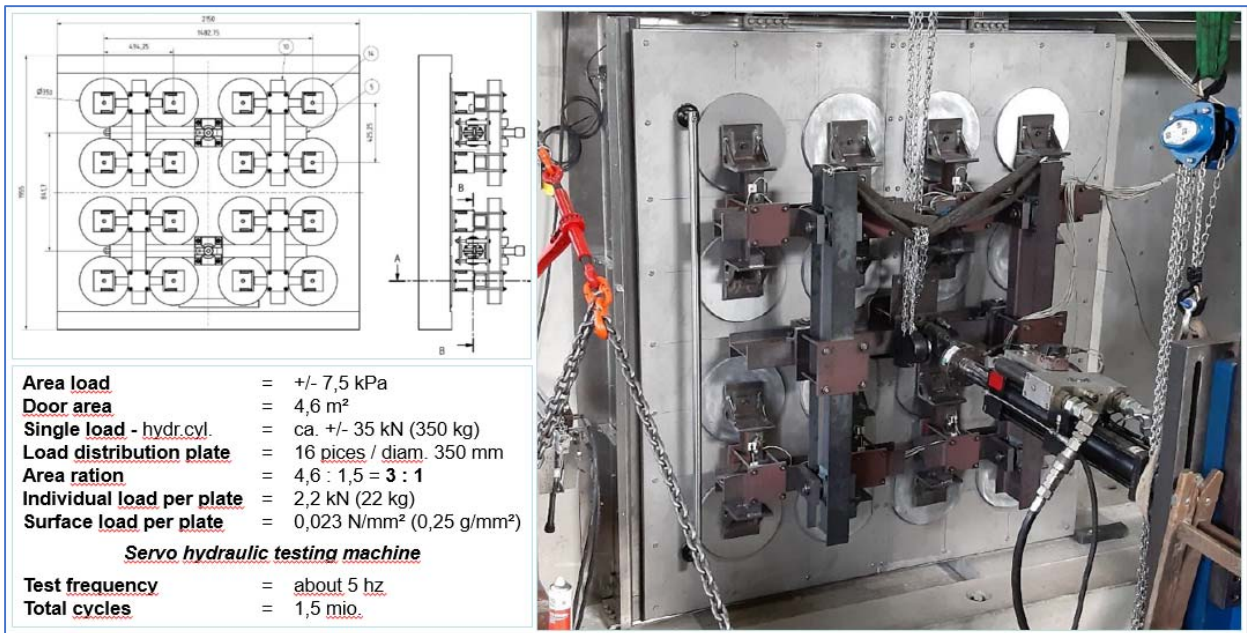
Test set up: concrete frame, sliding door, load transmission construction (servo-hydraulic testing device)
